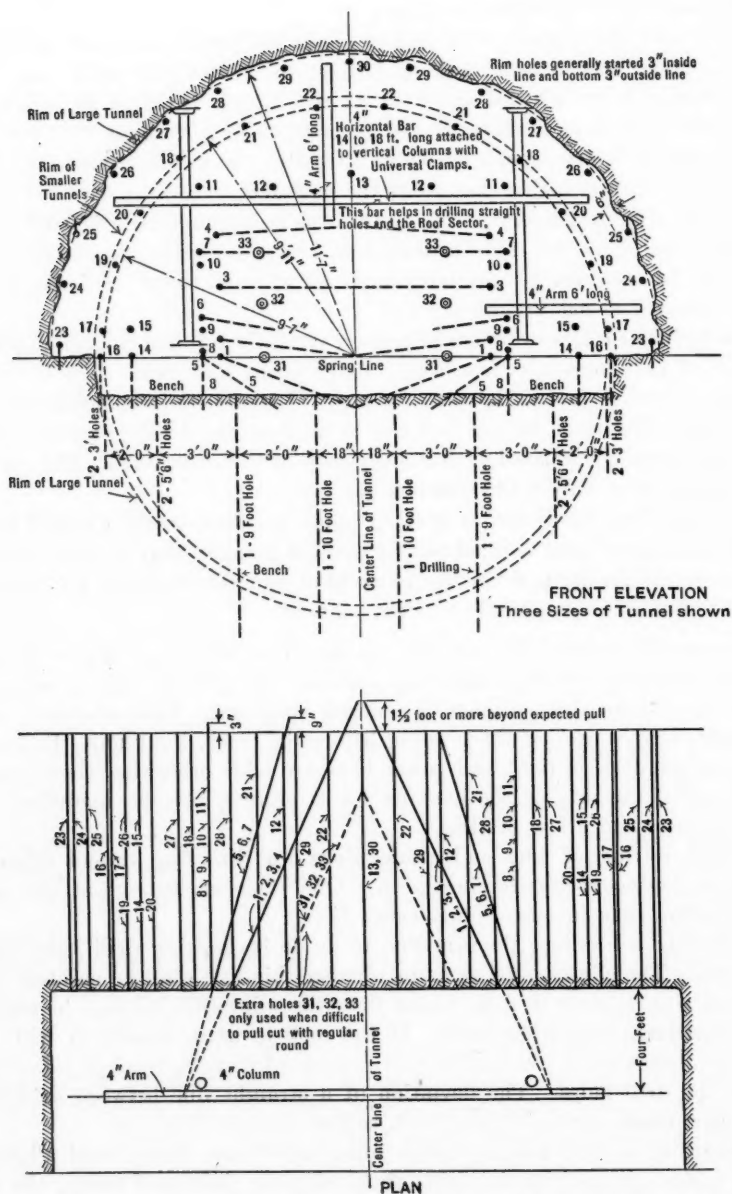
TUNNEL AT 54TH STREET AND EIGHTH AVENUE, NEW YORK, N. Y.
